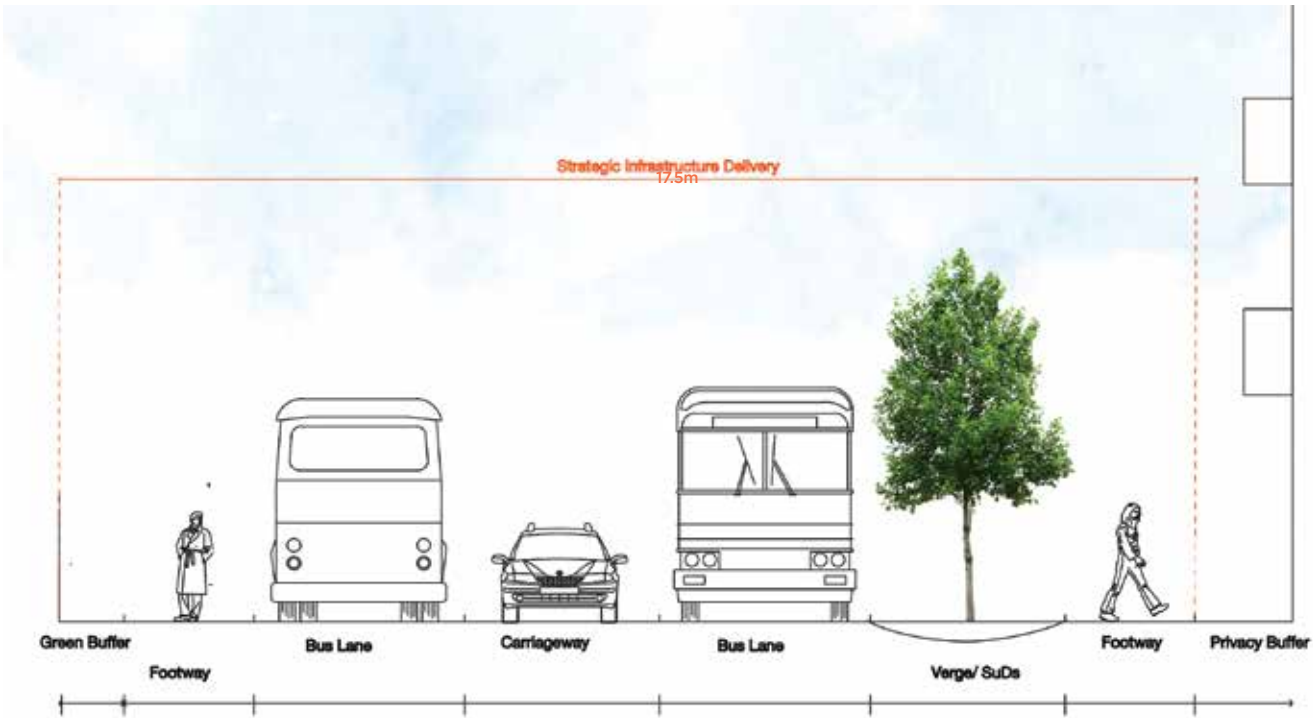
Proposed indicative cross section of Horgan's Street, One way multi modal
